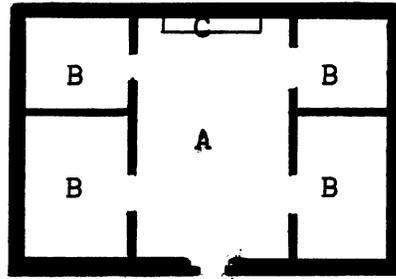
Ground Floor of Two-story House. A) Main Room, B) Room, C) Staircase
